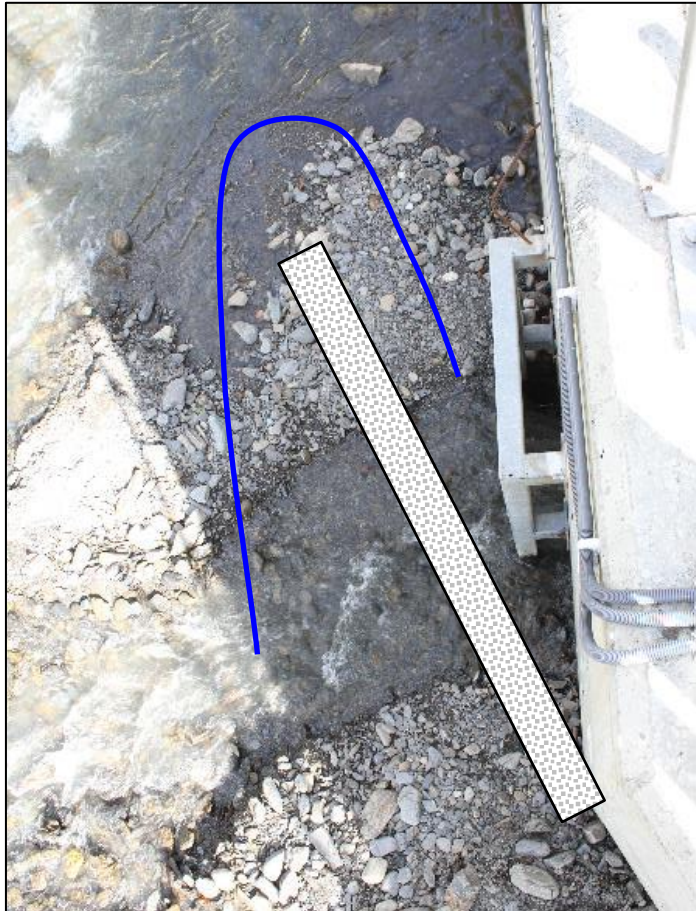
Potential modification of the exit area for the upstream fish passages at Lakhami 1 (photo) and Lakhami 2. Constructing a small concrete wall or installing a steel plate to change the fish passage opening from facing the river flow and material transport to being more sheltered behind a retrofitted structure. Fish then would need to move as indicated with the blue line and that area kept largely free from accumulating material to ensure continuous water flow and passage for fish.
